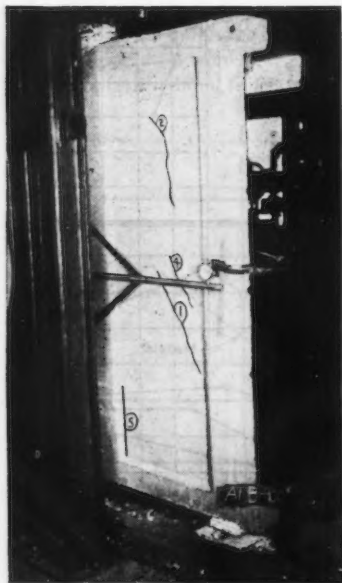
TYPE B SPECIMEN IN TESTING MACHINE
